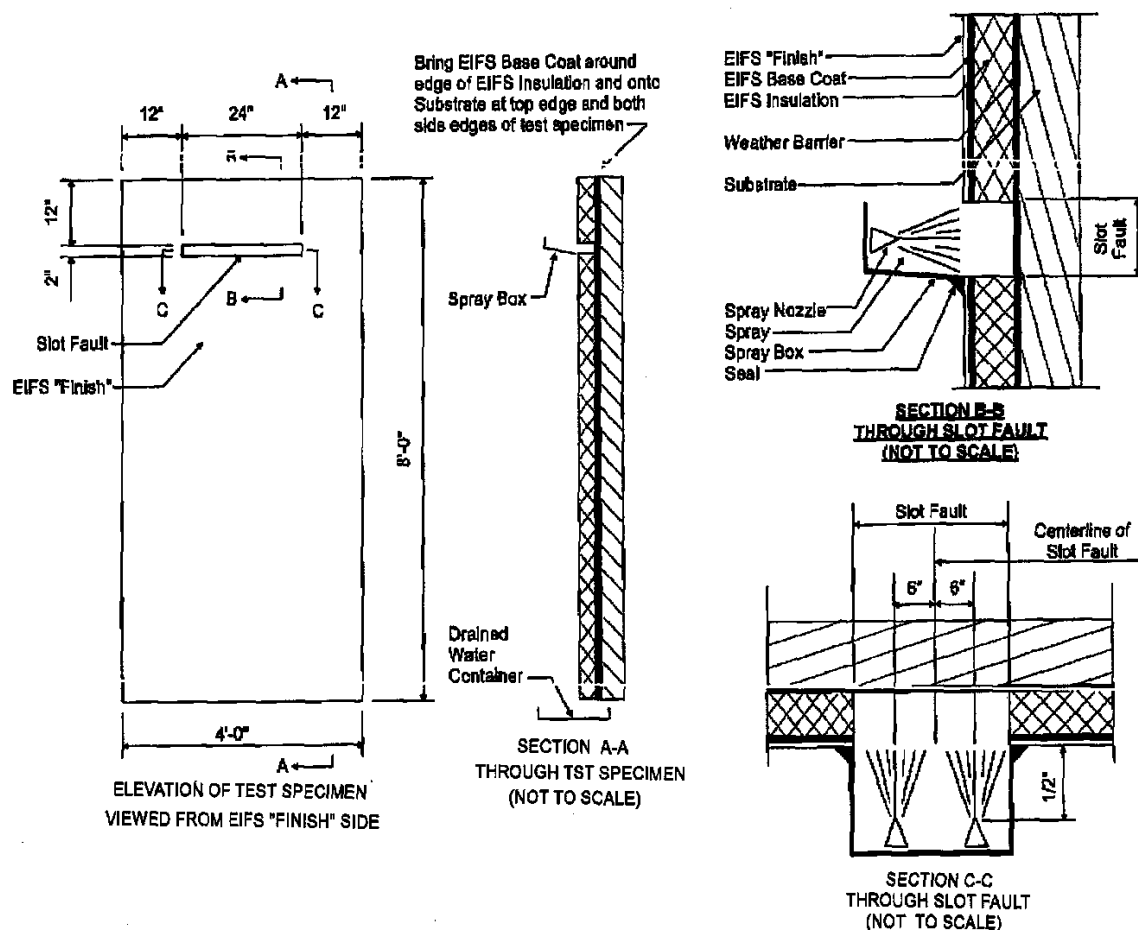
ASTM E2273-03 test set-up for EIFS walls
